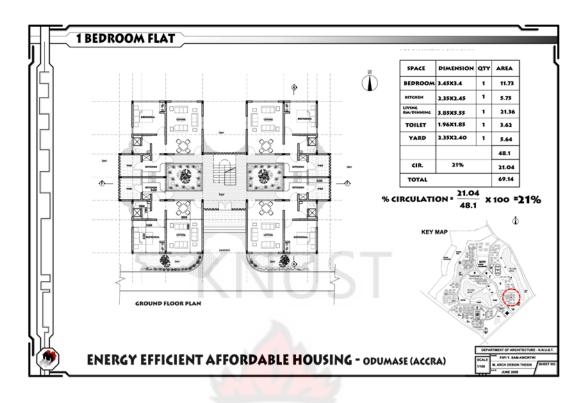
Ground Floor Plan of 1Bedroom Flat
